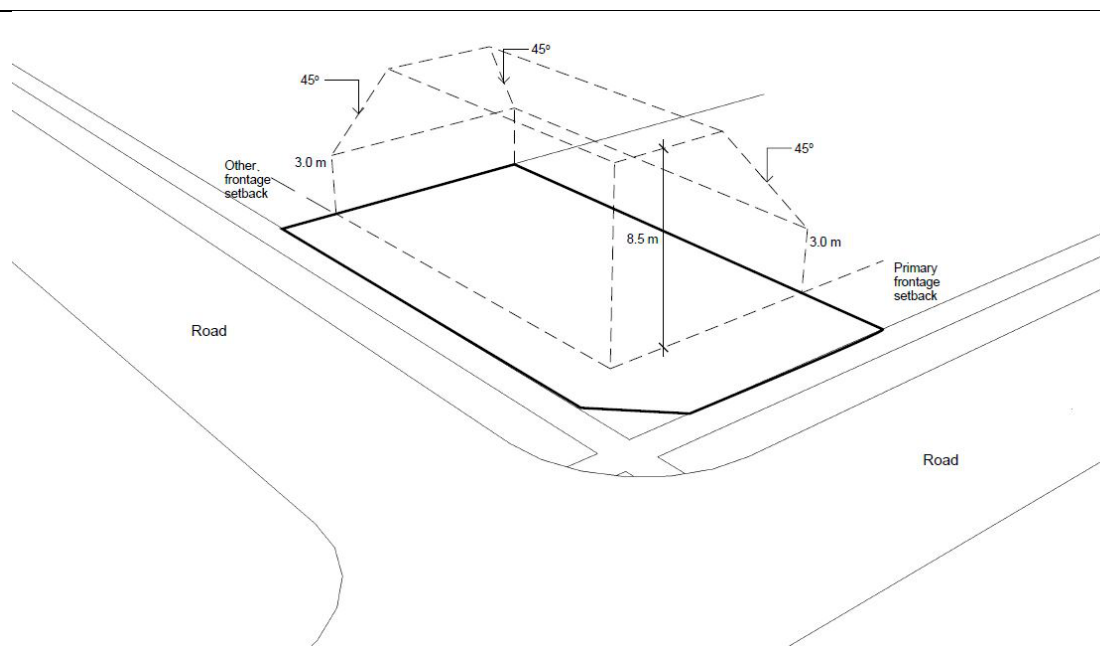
Building envelope for corner lots as required by clause 10.4.2 A3(a)
